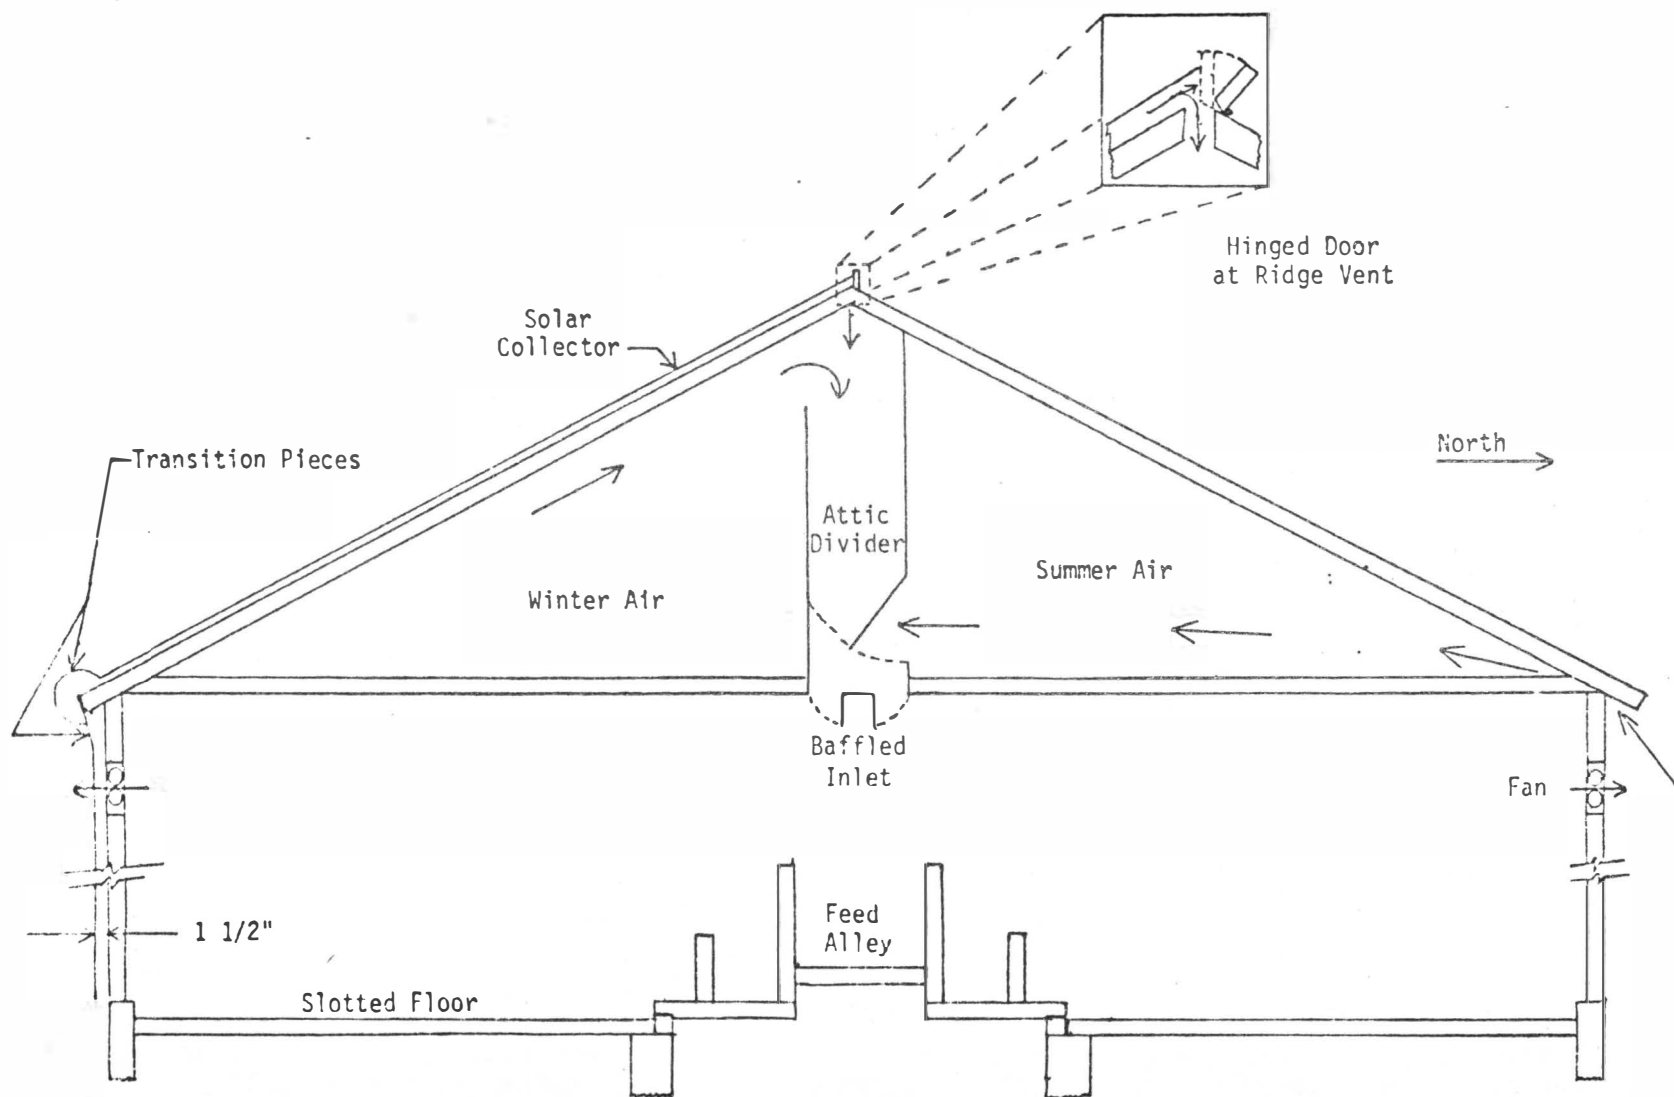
Building Cross-Section Illustrating the Baffled Center Ceiling Inlet System, Hinged Door at the Ridge Vent, and Transition Pieces.
